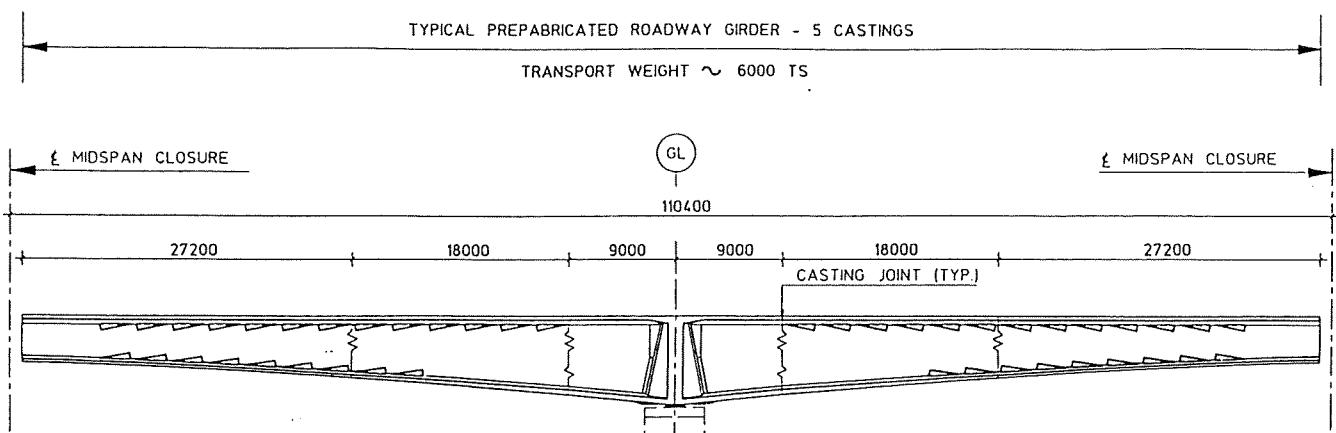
Prescast Concrete Bridge Superstructure. Longitudinal section.
